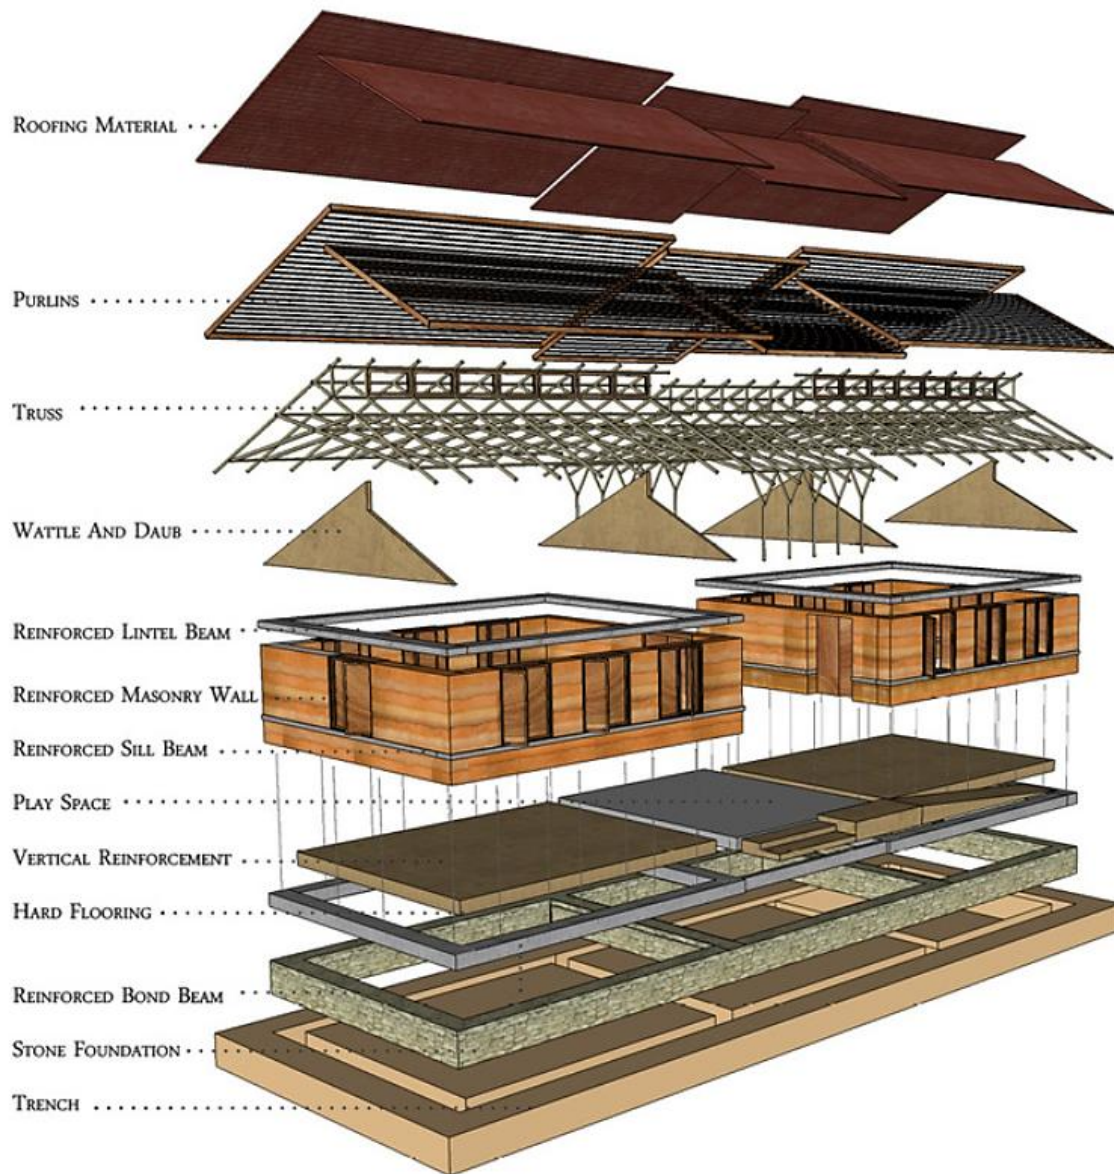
Construction details of the rammed earth (Source: Abari.earth)
